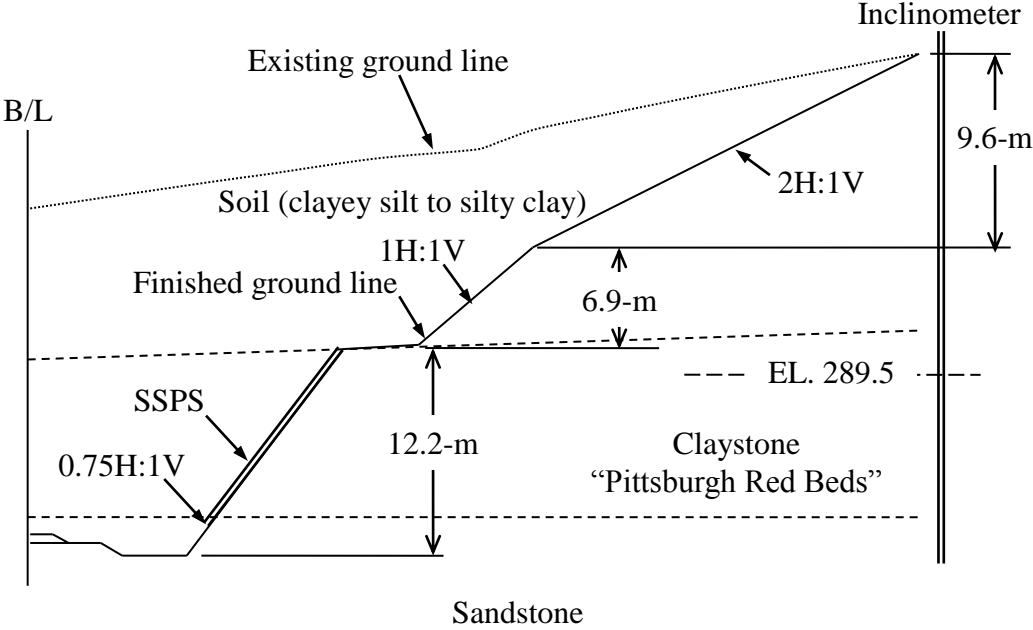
As-Built Conemaugh Slope Cross Section.
